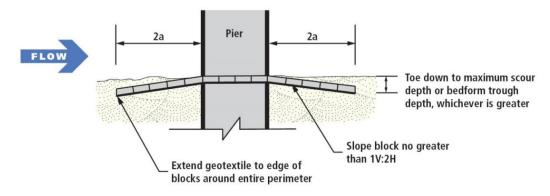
Recommended Layout Detail for Bank and Bed Armor
